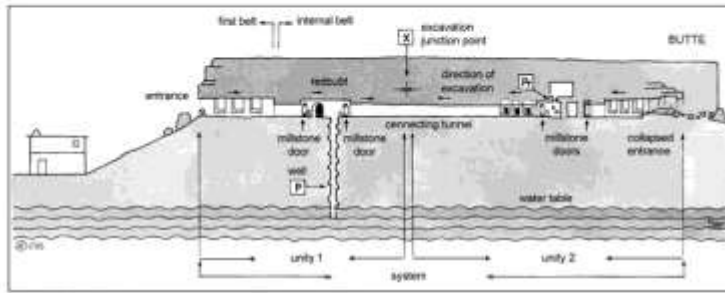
Schematic section of an underground shelter (drawing R. Bixio).
